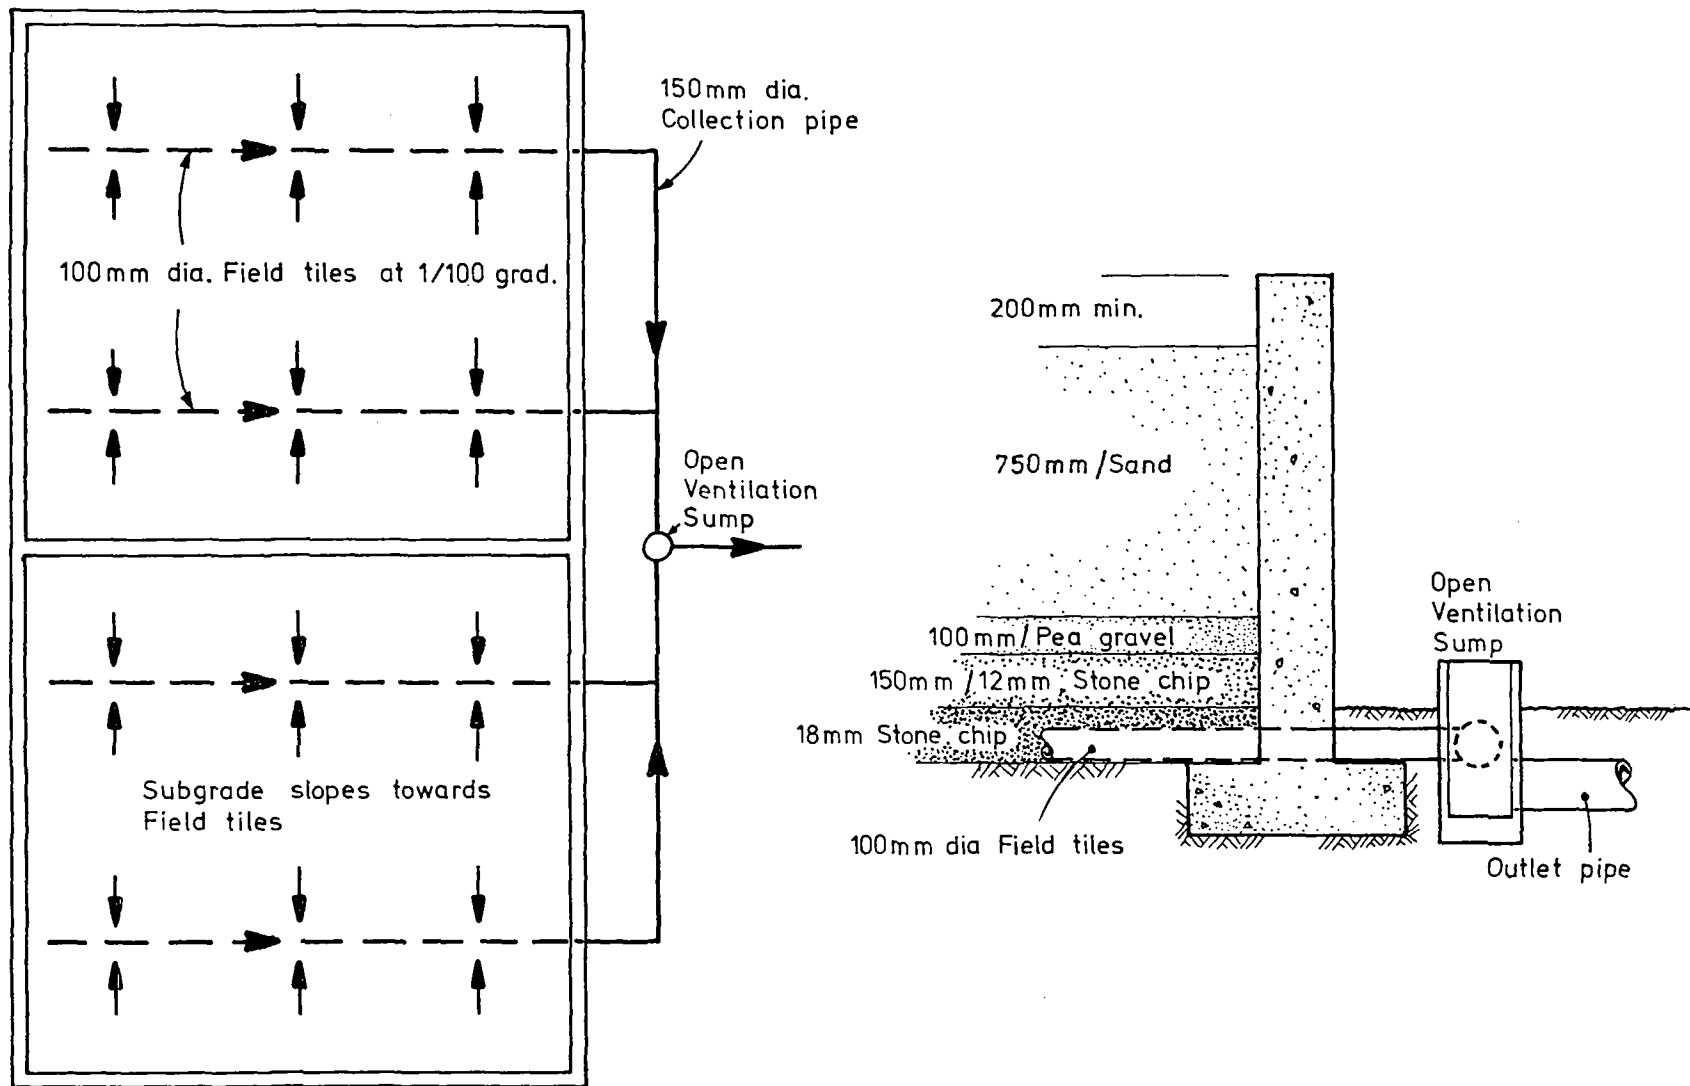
TYPICAL UNDERDRAIN ARRANGEMENT
